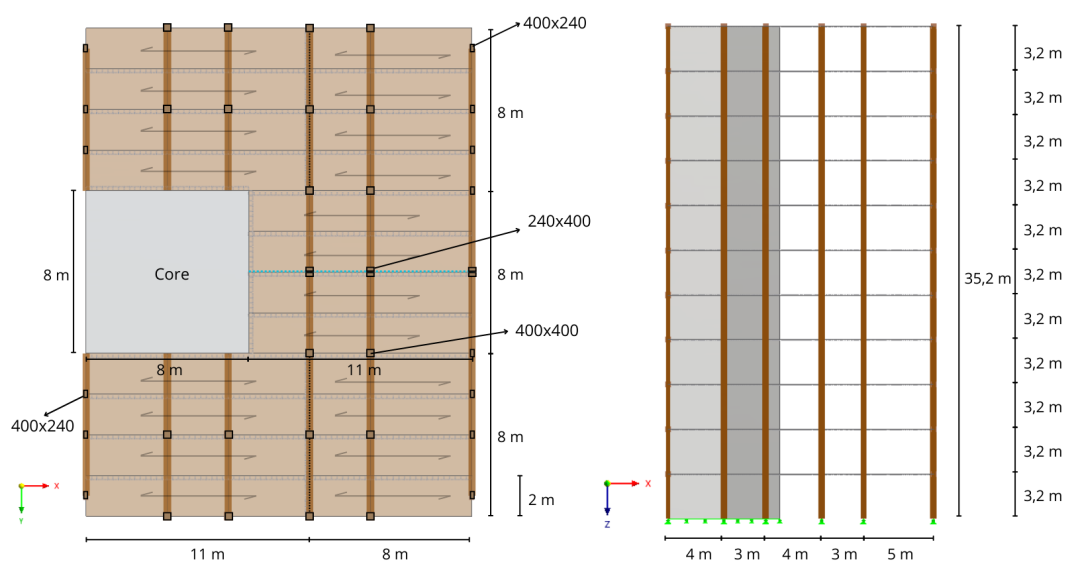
Floor plan (left) and cross section (right) of the case study building in RFEM.
